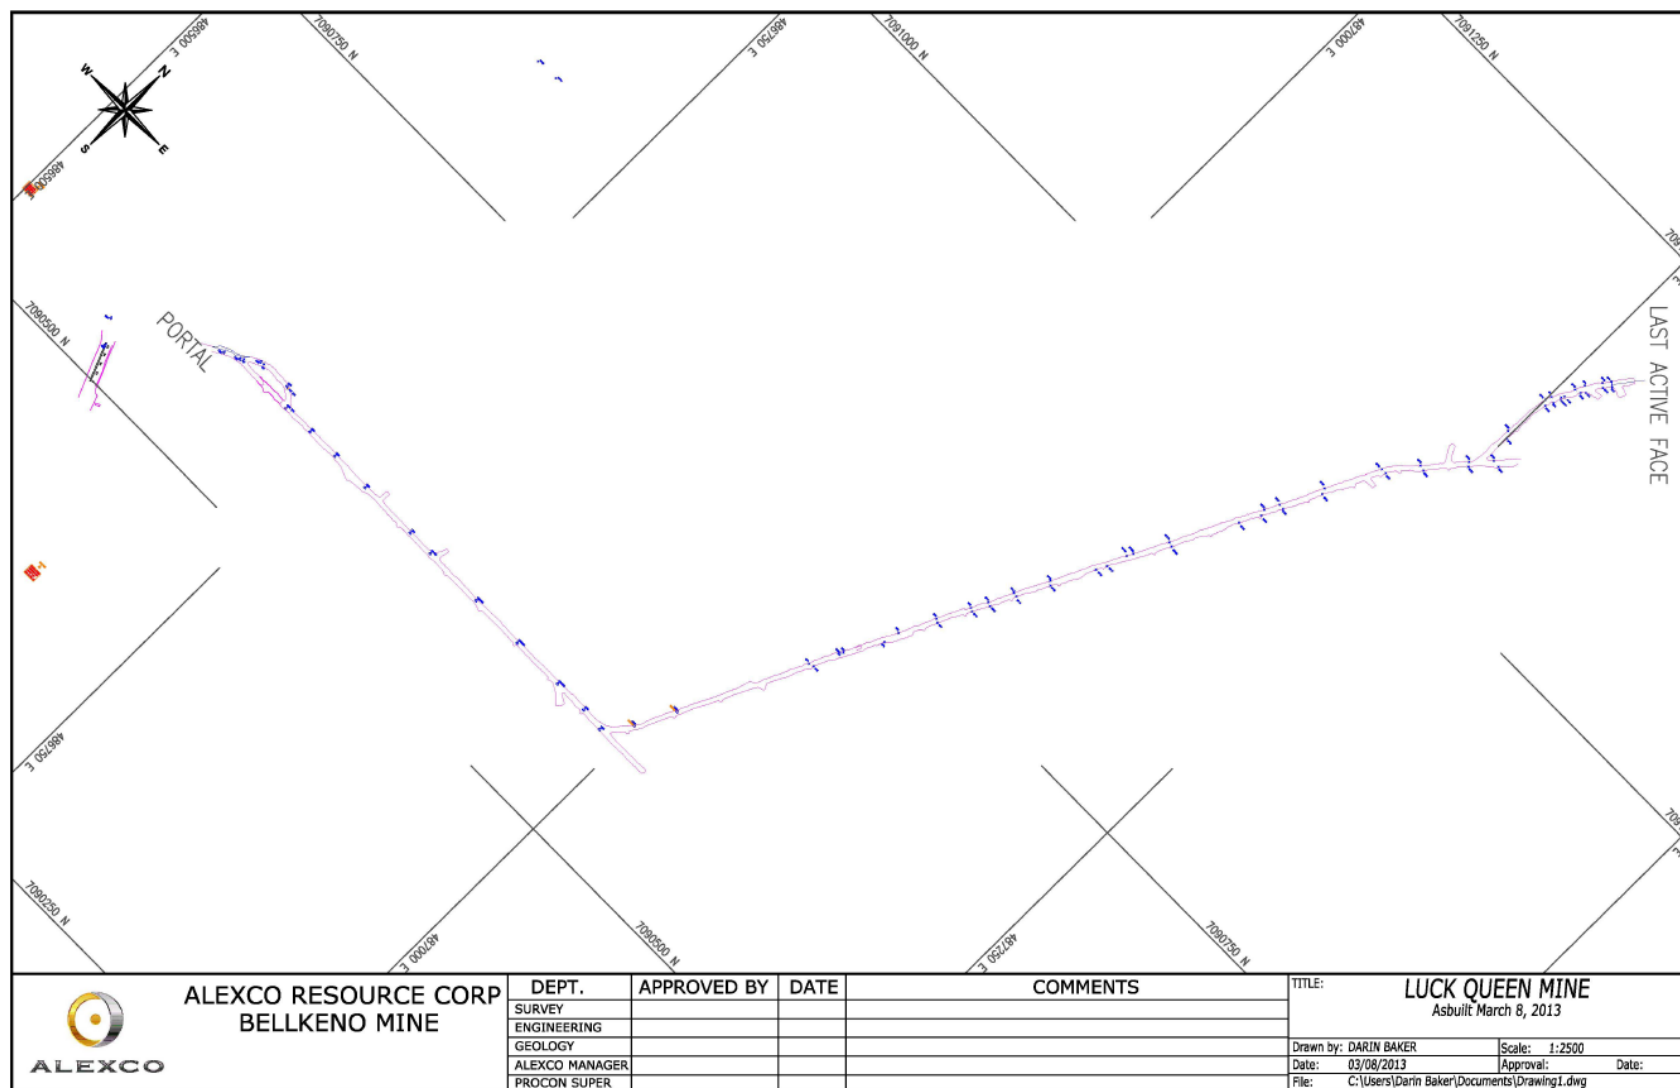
Plan View of Lucky Queen 500 Underground Development As-Built
